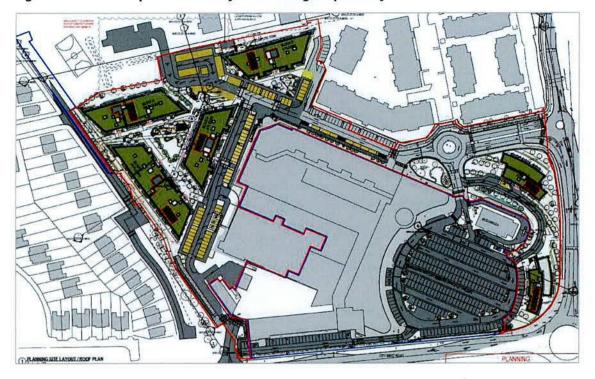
Excerpt from Site Layout Drawing Prepared by MDO.
